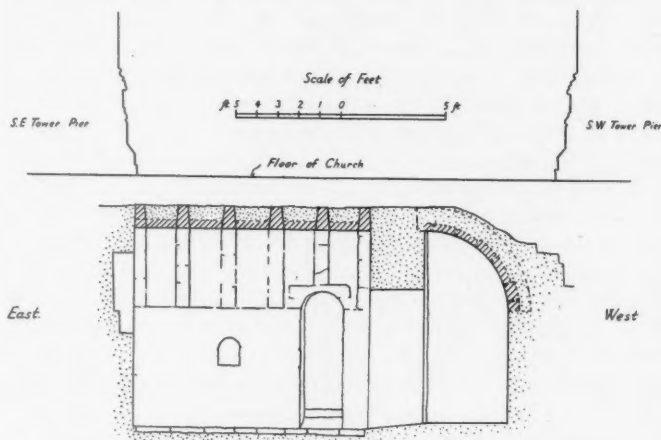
Ripon Minster: section of vault of crypt, showing rib construction
